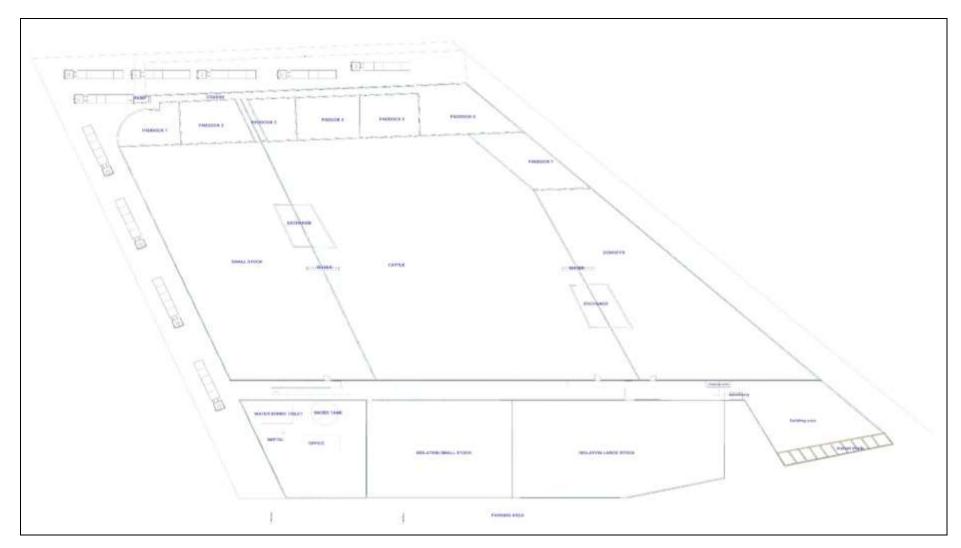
Proposed Design Layout of the Kimana Sale Yard See more details on design at appendix 4.
